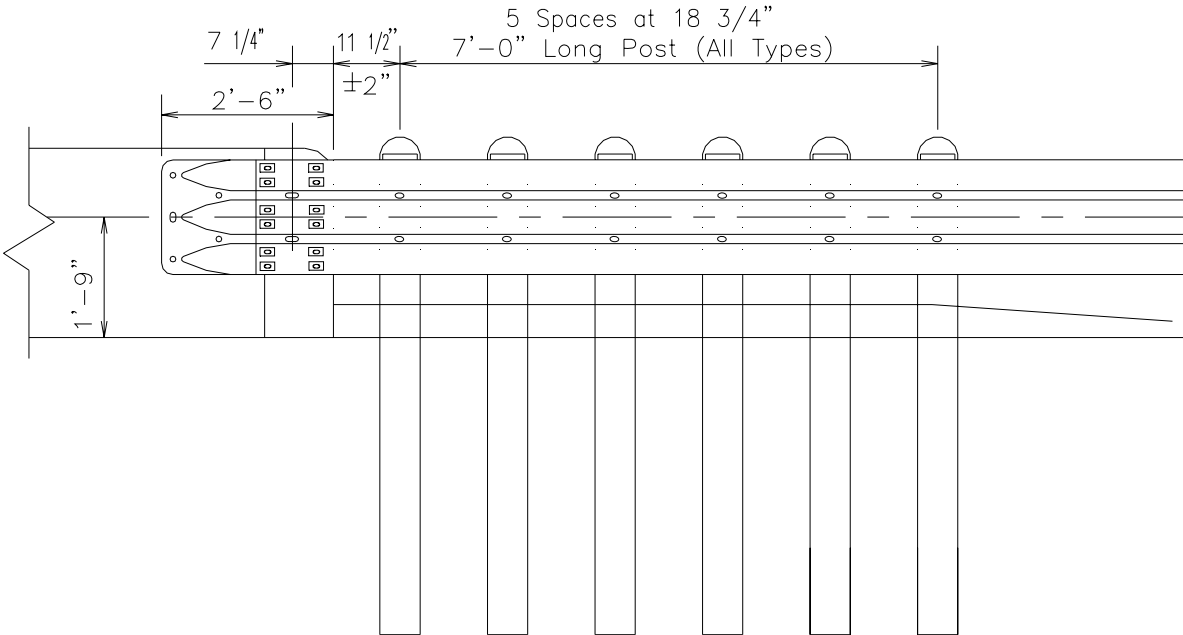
Elevation of Texas TL-3 Guardrail-to-Concrete Bridge Rail Transition.
